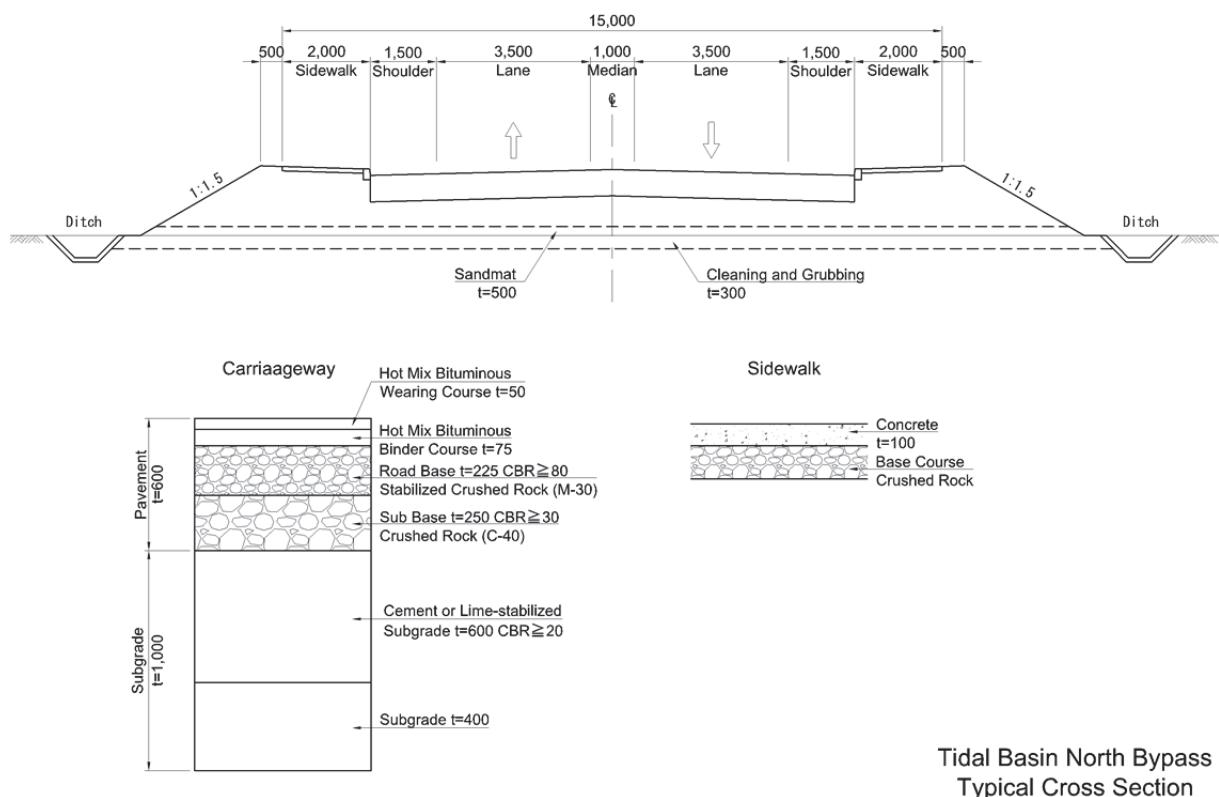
Typical Cross Section of the Tidal Basin North Bypass
